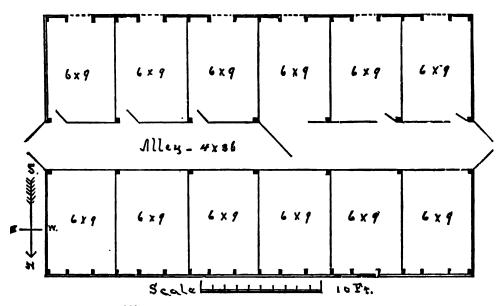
AN ILLINOIS HOGHOUSE (ARRANGEMENT OF FLOOR).
